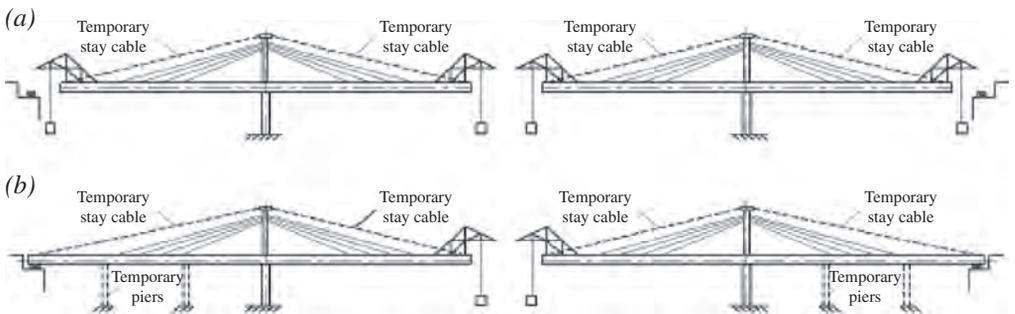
Possible construction method of Extradosed Bridges using temporary stay cables
